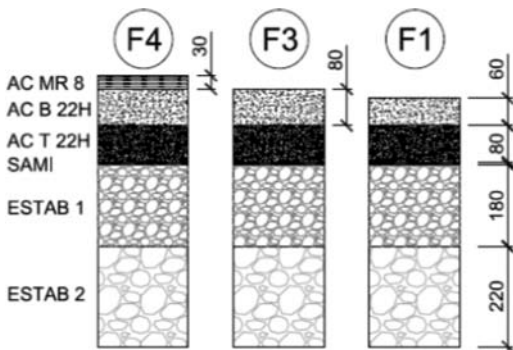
Schematic of three pavement structures at Filderren (Pugliesi et al., 2010).
